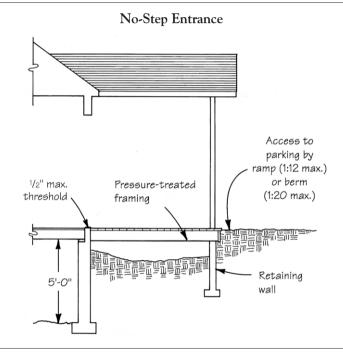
An accessible house must have at least one "no-step" entrance, such as this porch, which serves as a level bridge between the ground-floor entrance and an earth berm leading from the parking area.
